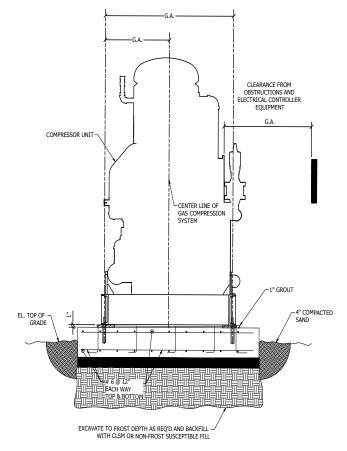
Concrete Pad with Compressor Unit Dimensions - Front View
